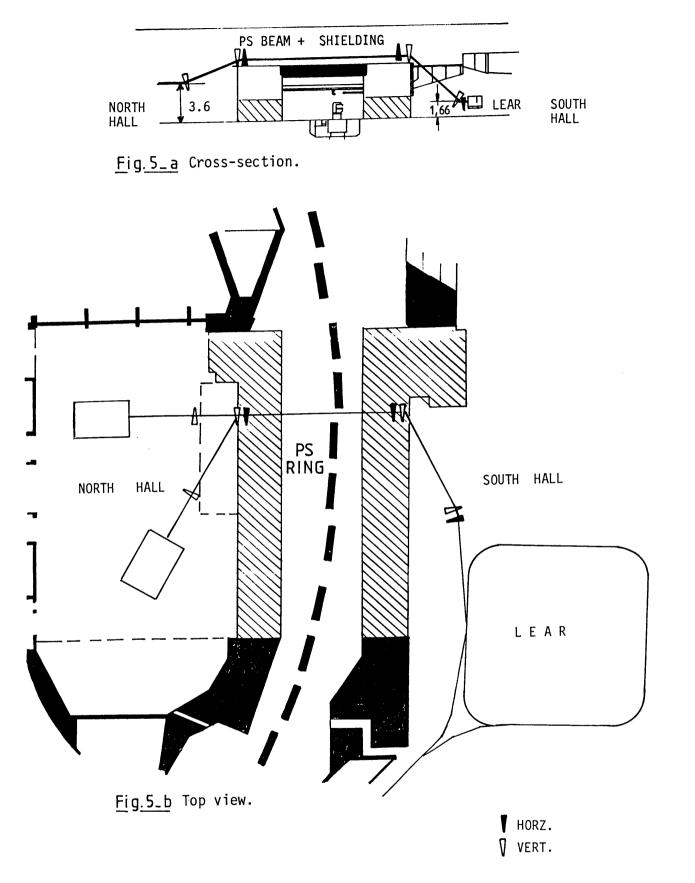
POSSIBLE LAYOUT OF A TRANSFER LINE <u>ABOVE</u> THE PS TUNNEL TO THE NORTH HALL.
